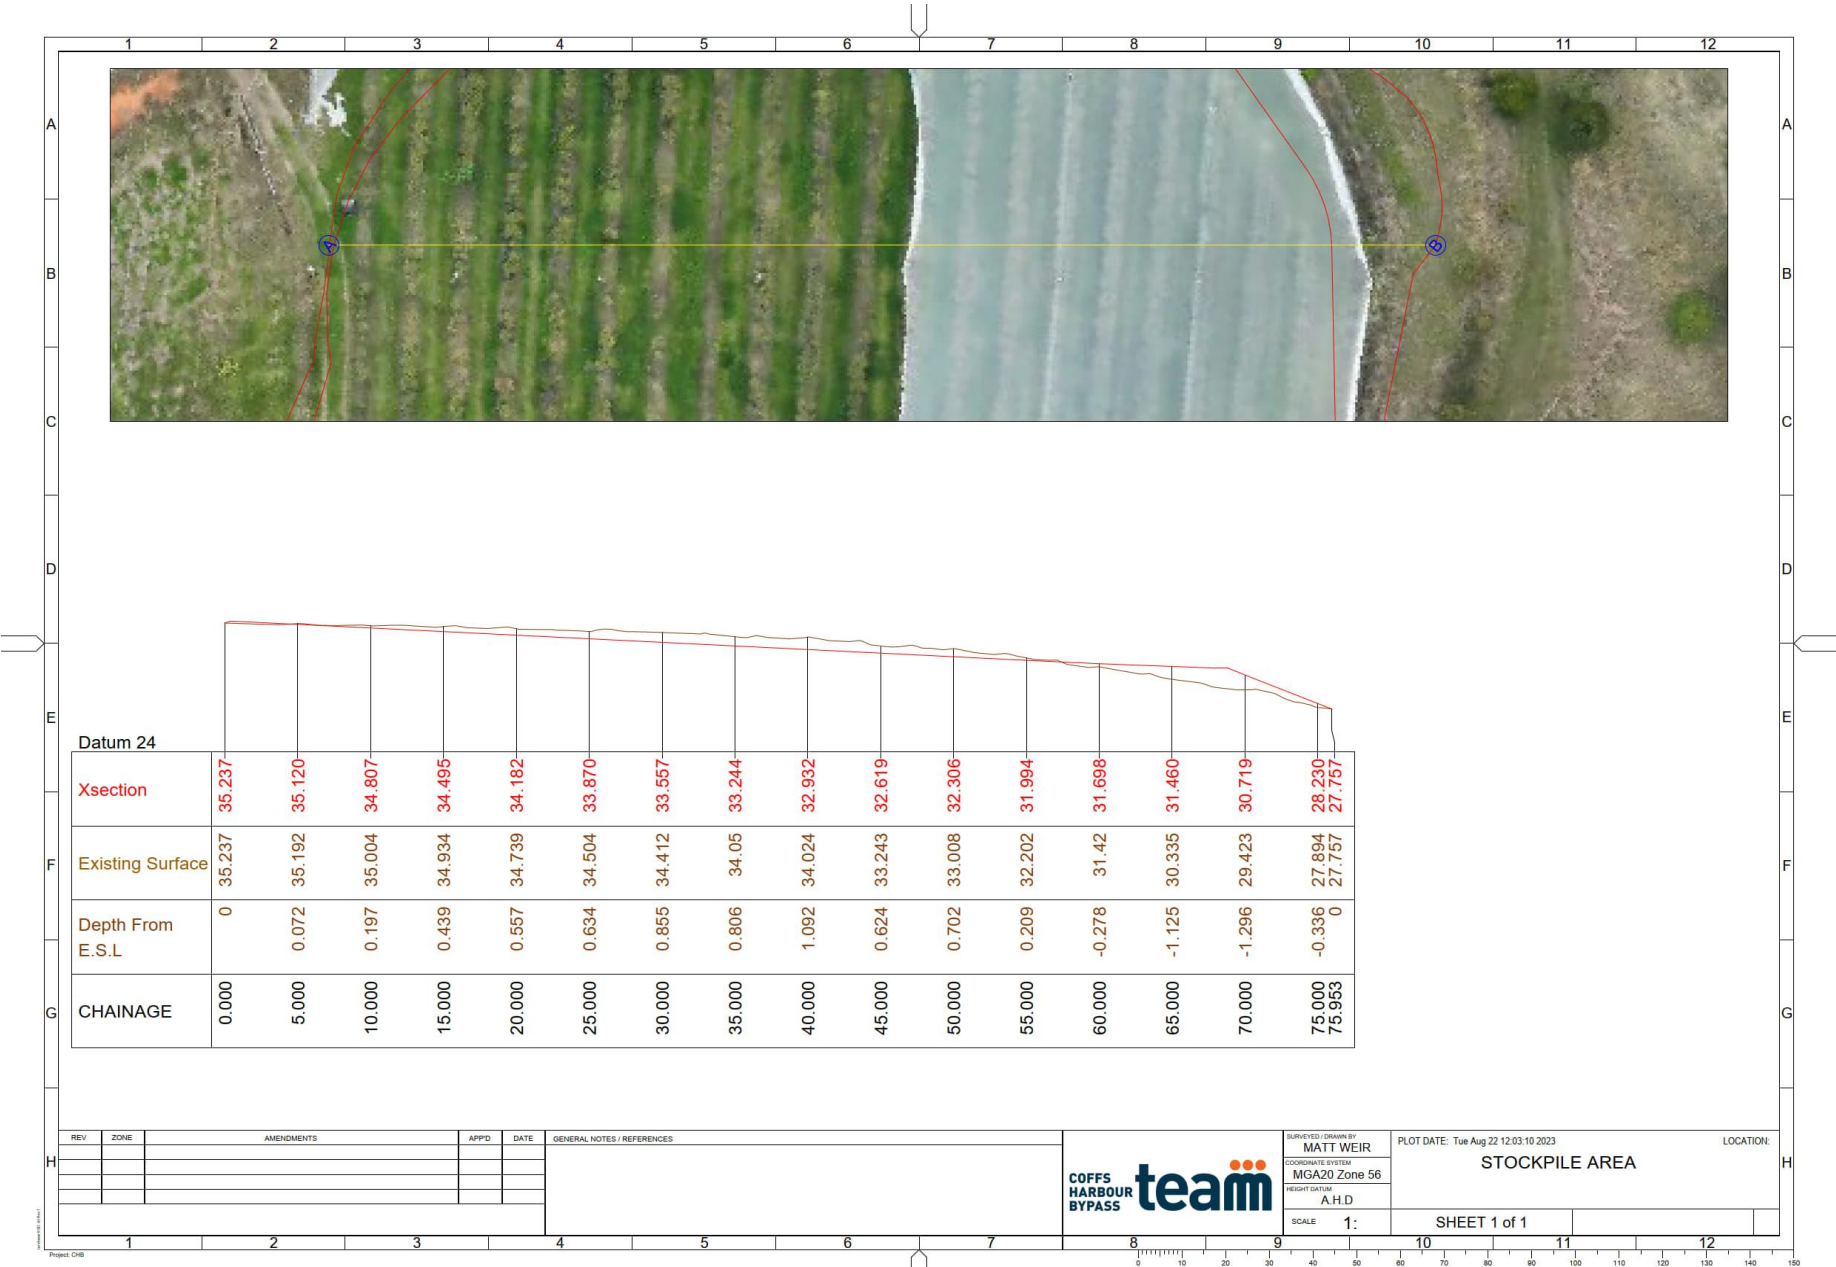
PROPOSED ANCILLARY FACILITY BOUNDARY – CUT FILL CROSS SECTION
